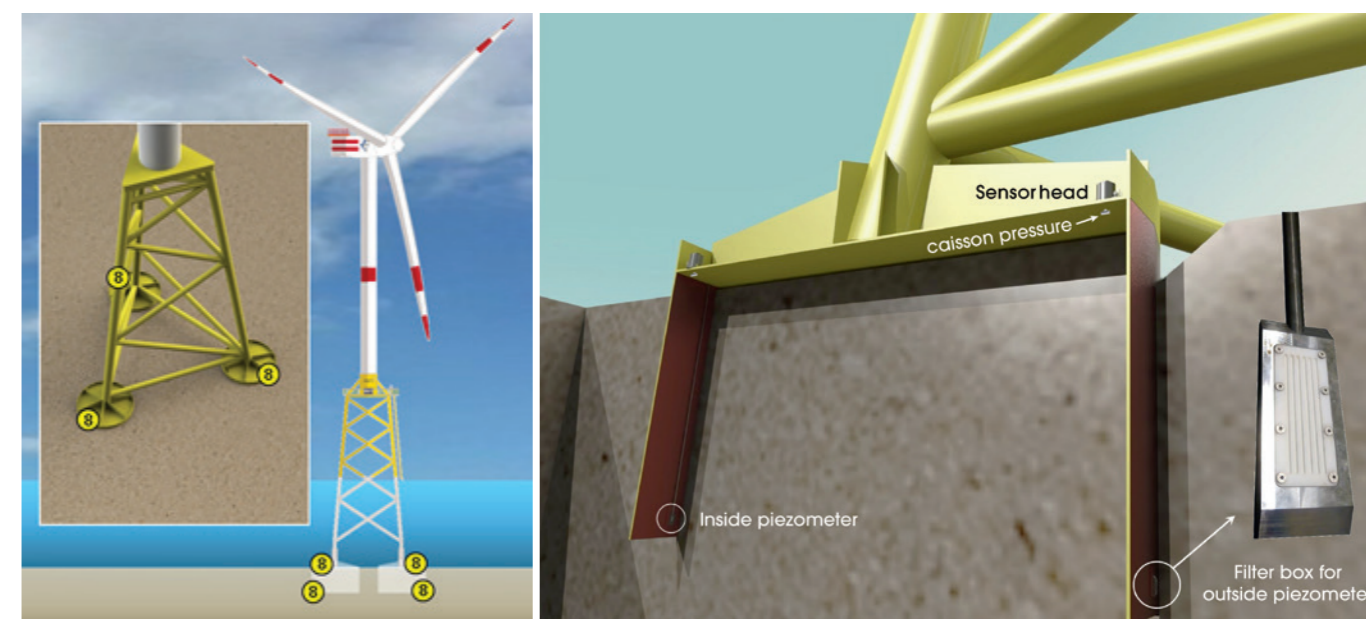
Caisson piezometers (8) on a tripod jacket with caisson foundations
